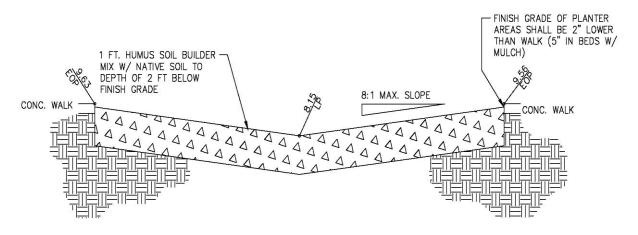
Typical swale cross section used throughout the site (picture used with permission from Rushton & Hastings, 2001)
